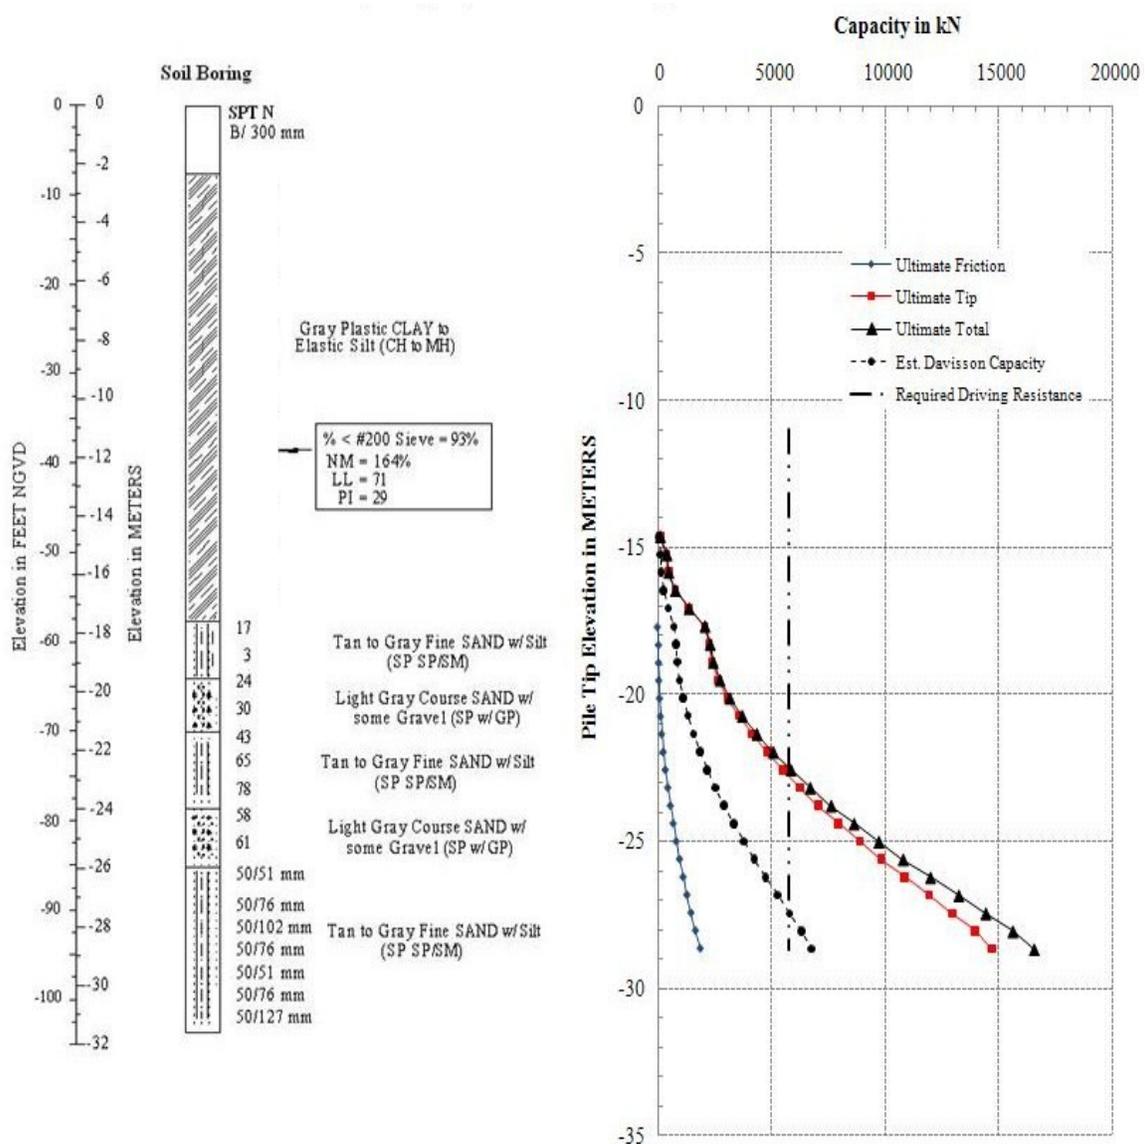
Soil boring and geotechnically calculated pile capacities.
